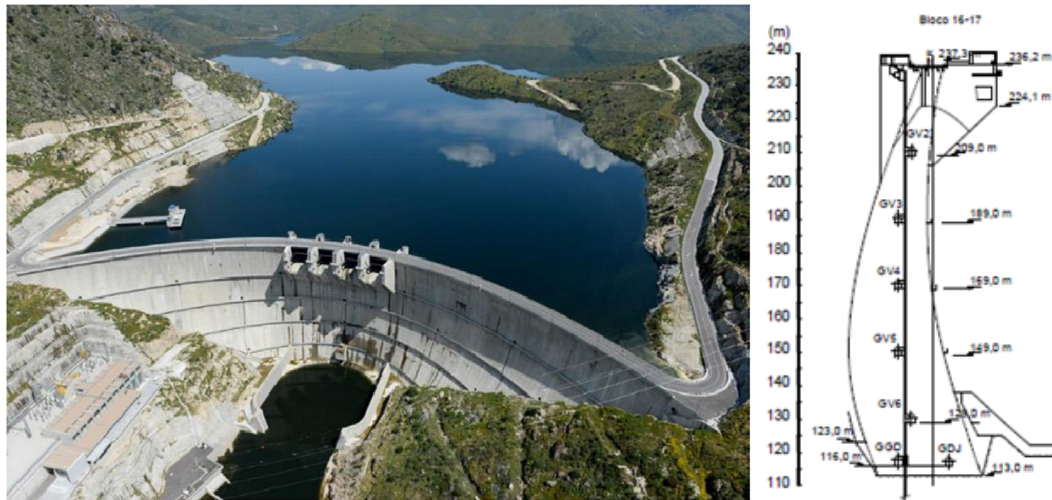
View of Baixo Sabor arch dam and cross-section through the central cantilever
